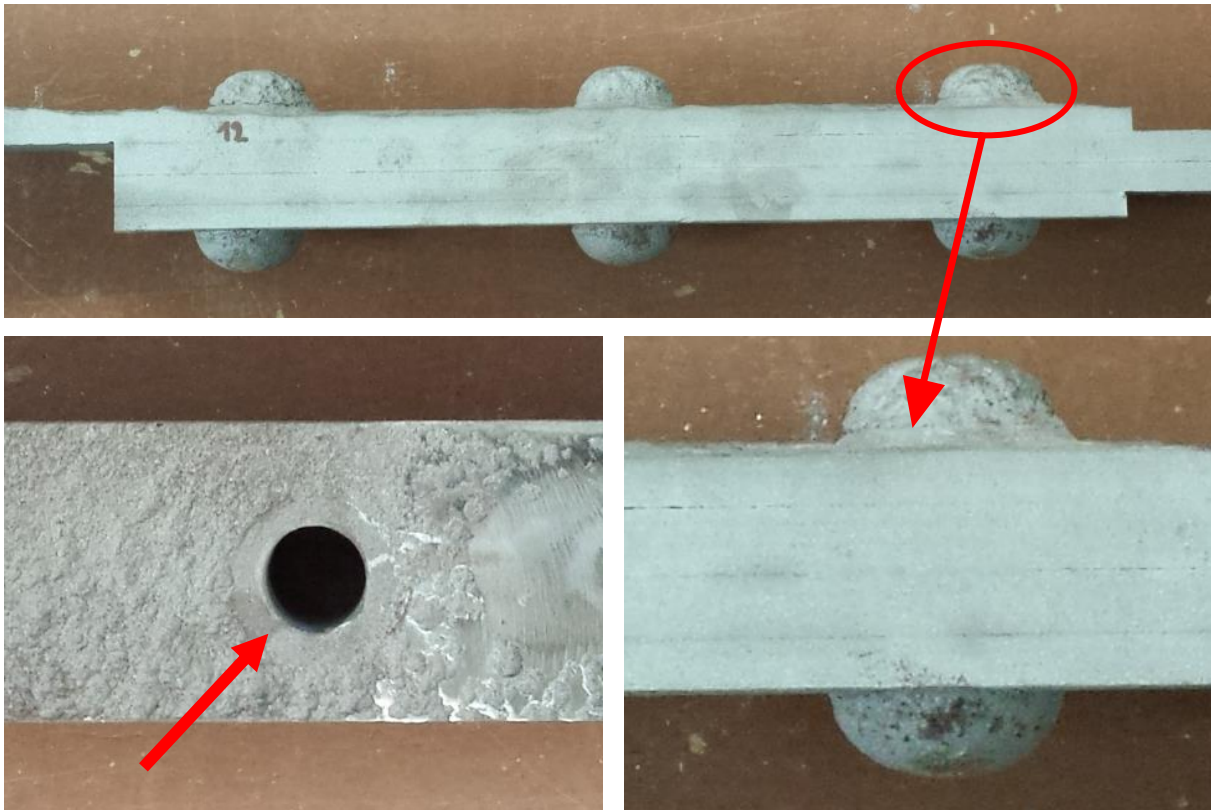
The shape of the corrosion weakening of the plate surface around the rivet head. Above: side view of the tested sample. Left: view of the rivet hole after removal of the rivet (the area around the hole across the width of the rivet head is free of corrosion weakening). Right: detail of the specimen from the side (the sheet metal under the rivet head is not corrosion weakened in comparison to the rest of the sheet metal).
